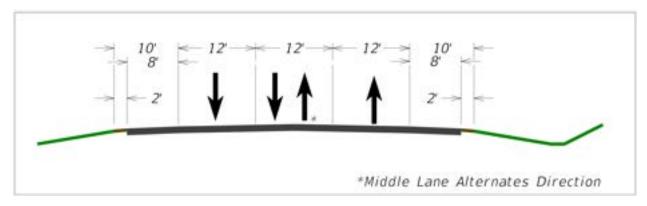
PROPOSED TYPICAL SECTION FOR 2+1 WIDENING
